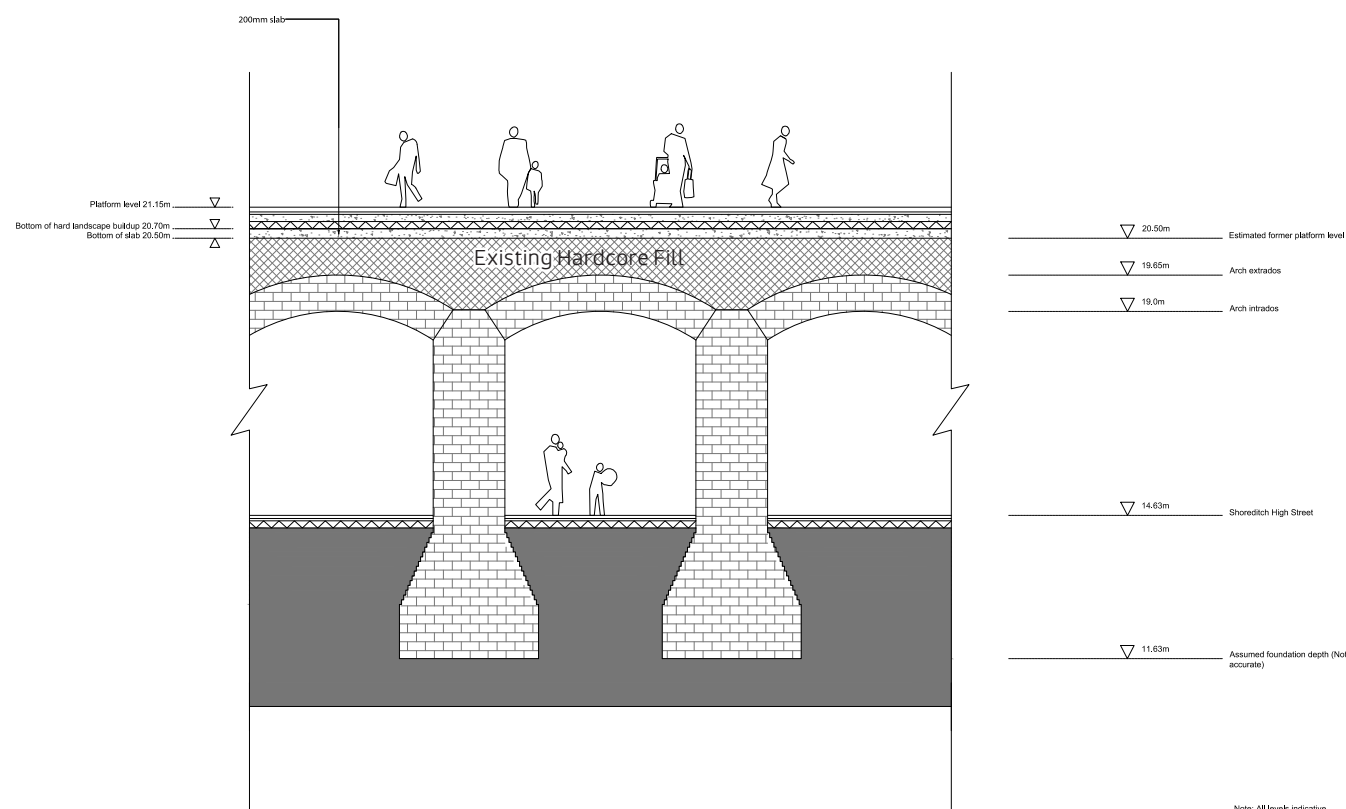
Typical public realm and landscape build up over Commercial Street arches
